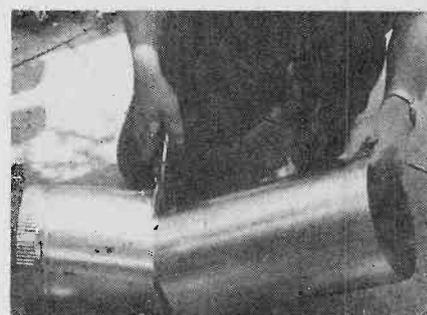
The damper assembly is generally long enough to pass through thin-walled buildings. If you need extra length, standard 8-in. flue pipe obtainable at local plumbing outlets can be cut to size.
